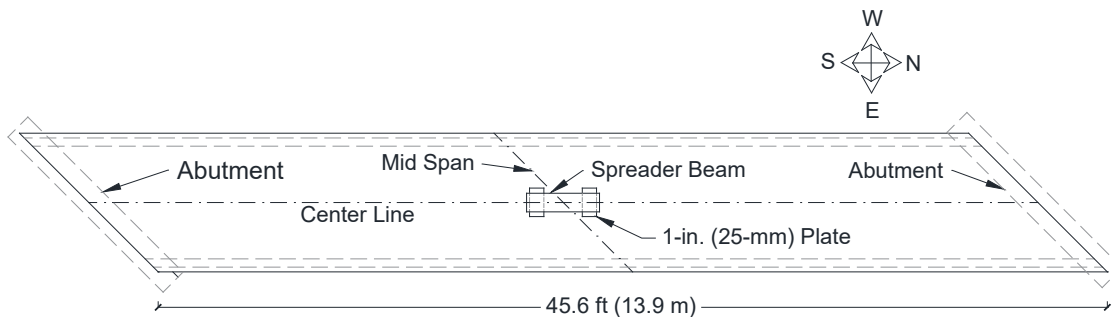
Point Loads in Plan View of 50-ft (15.24-m) Long Girder
